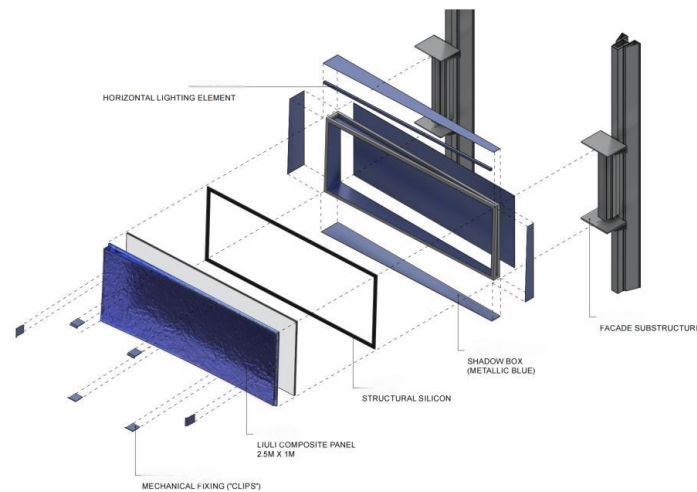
Construction Detail of the Large-Scale Corrugated Three-Dimensional LIULI Composite Curtain Wall Unit
